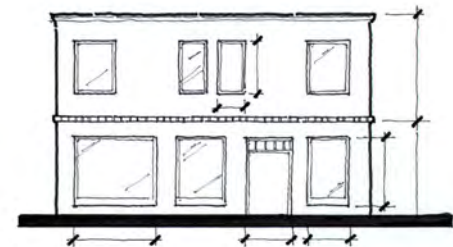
Ground level facades between 50% and 80% transparency, and upper level facades between 25% and 60% transparency.
